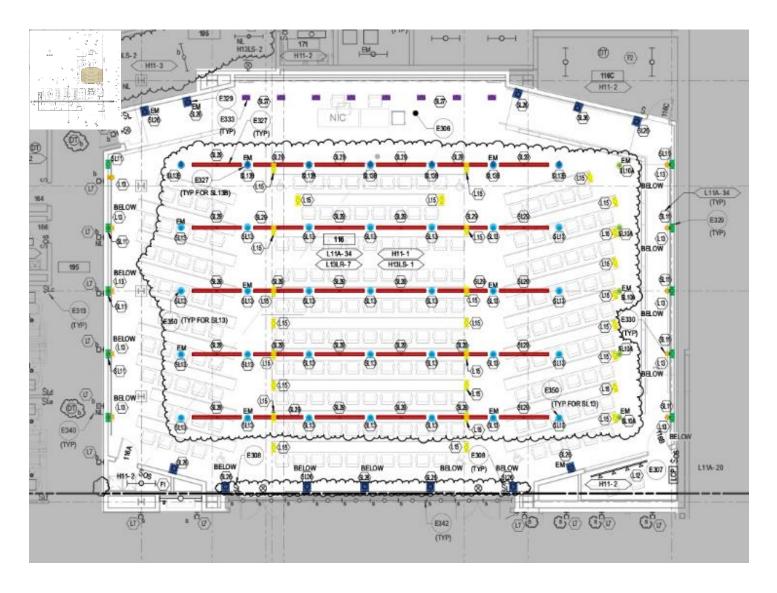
| plan highlighting the lecture hall existing lighting (colors match fixture schedule)
